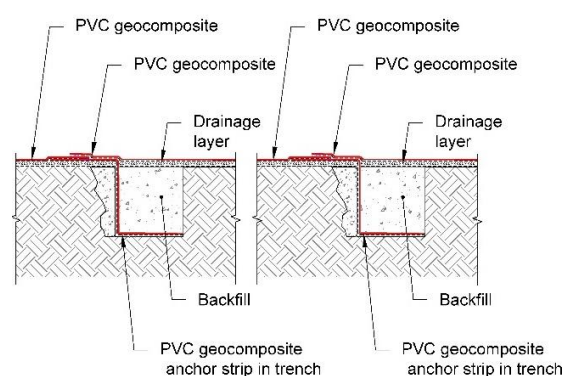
Geocomposite anchored by PVC anchor strips embedded in trenches at Bulga GFED (2016)
